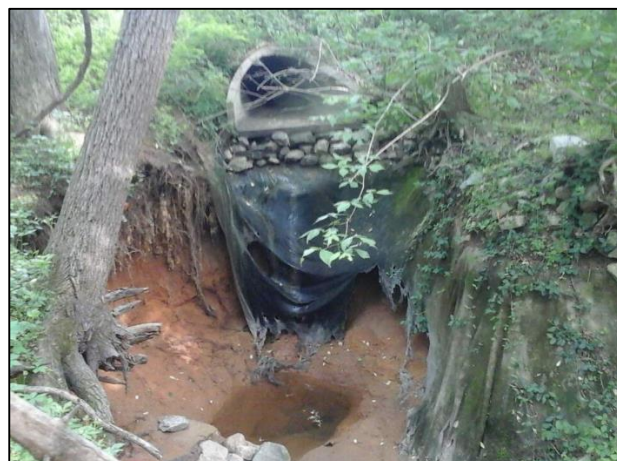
Typical degraded outfall channels observed during Outfall Stabilization Assessments
